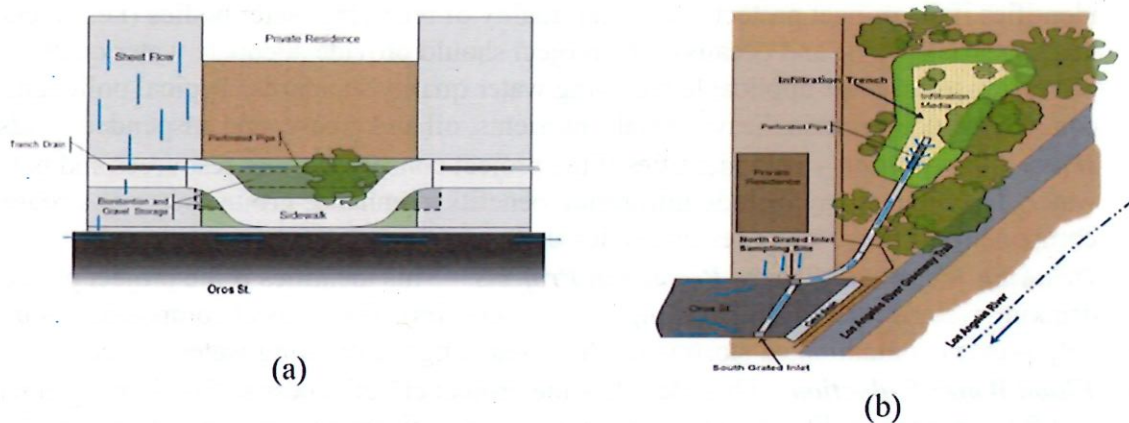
Oros Green Street Overview (a) sidewalk and (b) infiltration trench design.
